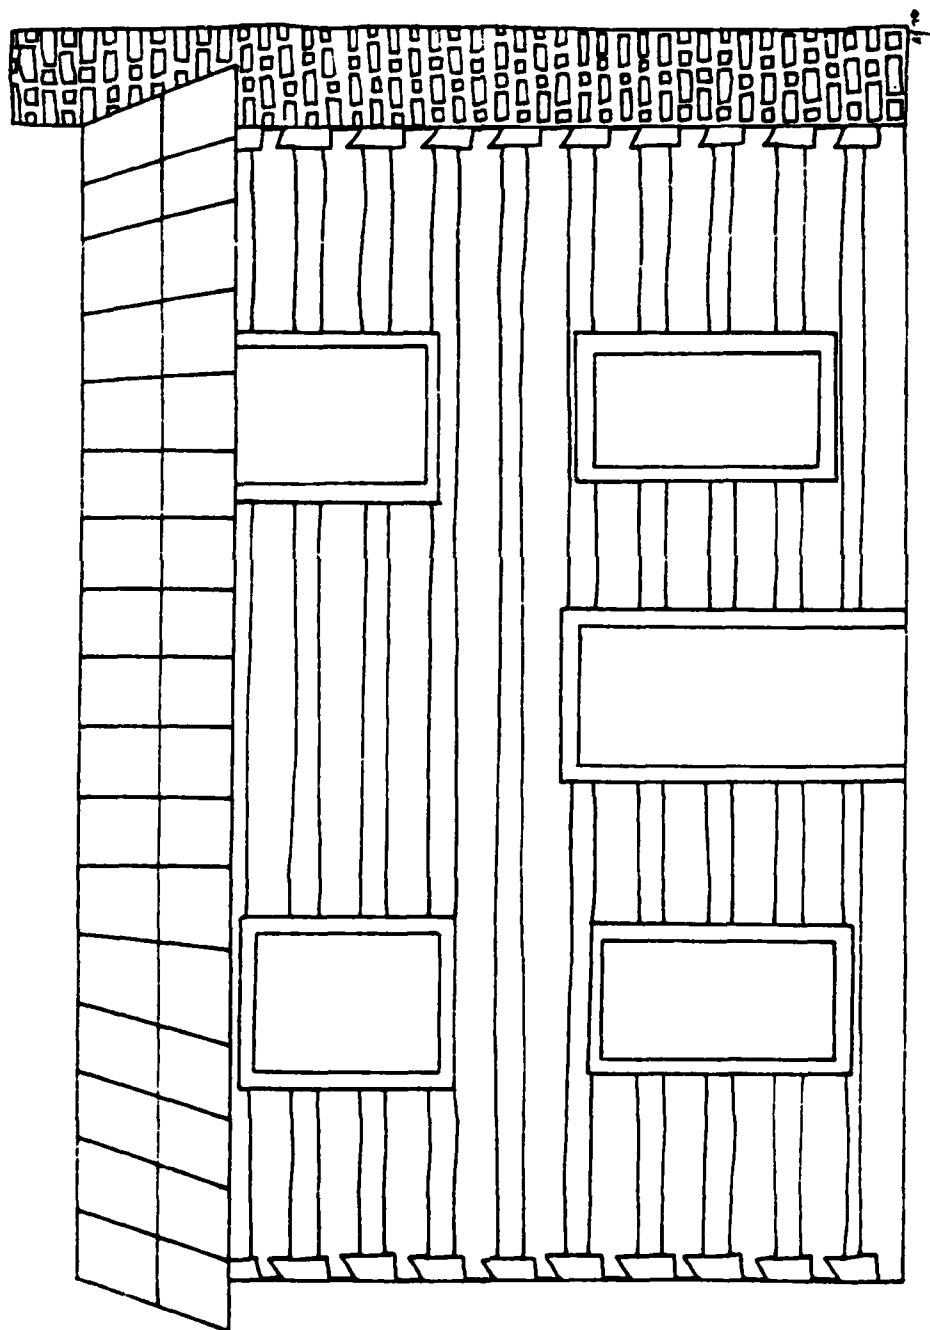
Drawing of southwest wall of dwelling on Tract 239.
